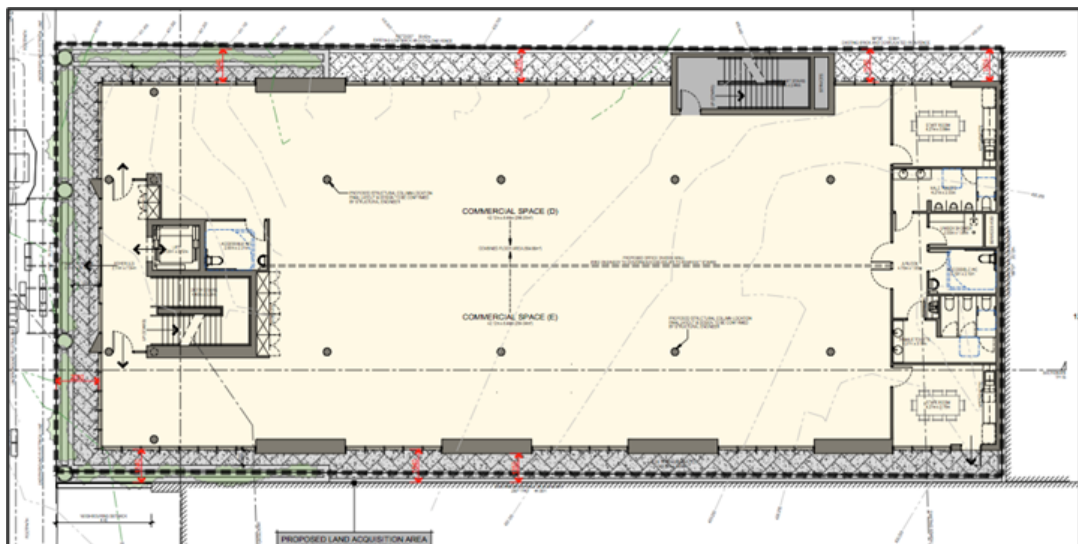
Levels 2-4 floor plan. Source Application plans Project Now Architects
